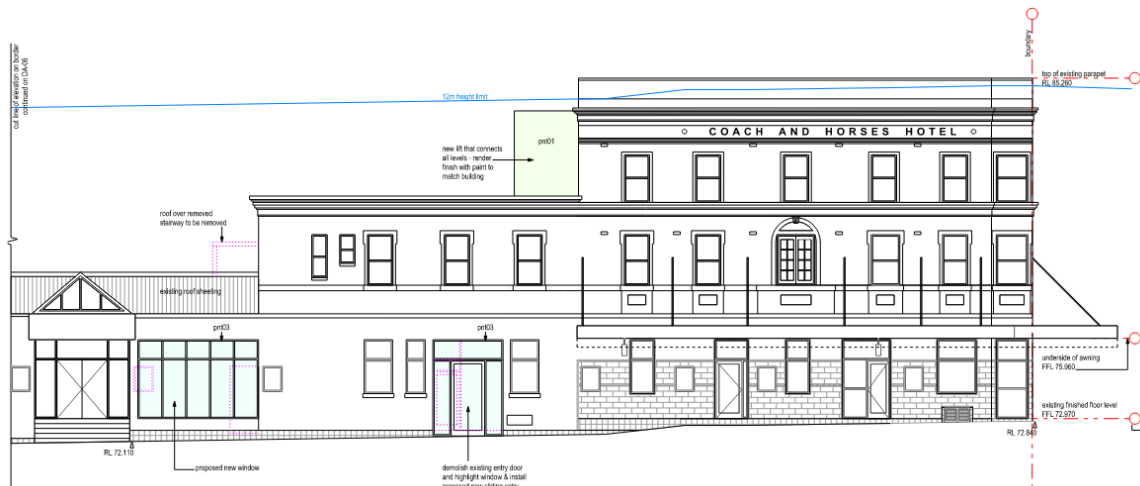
Proposed northern elevation – Alison Road (Source: Darren Mah Design)
